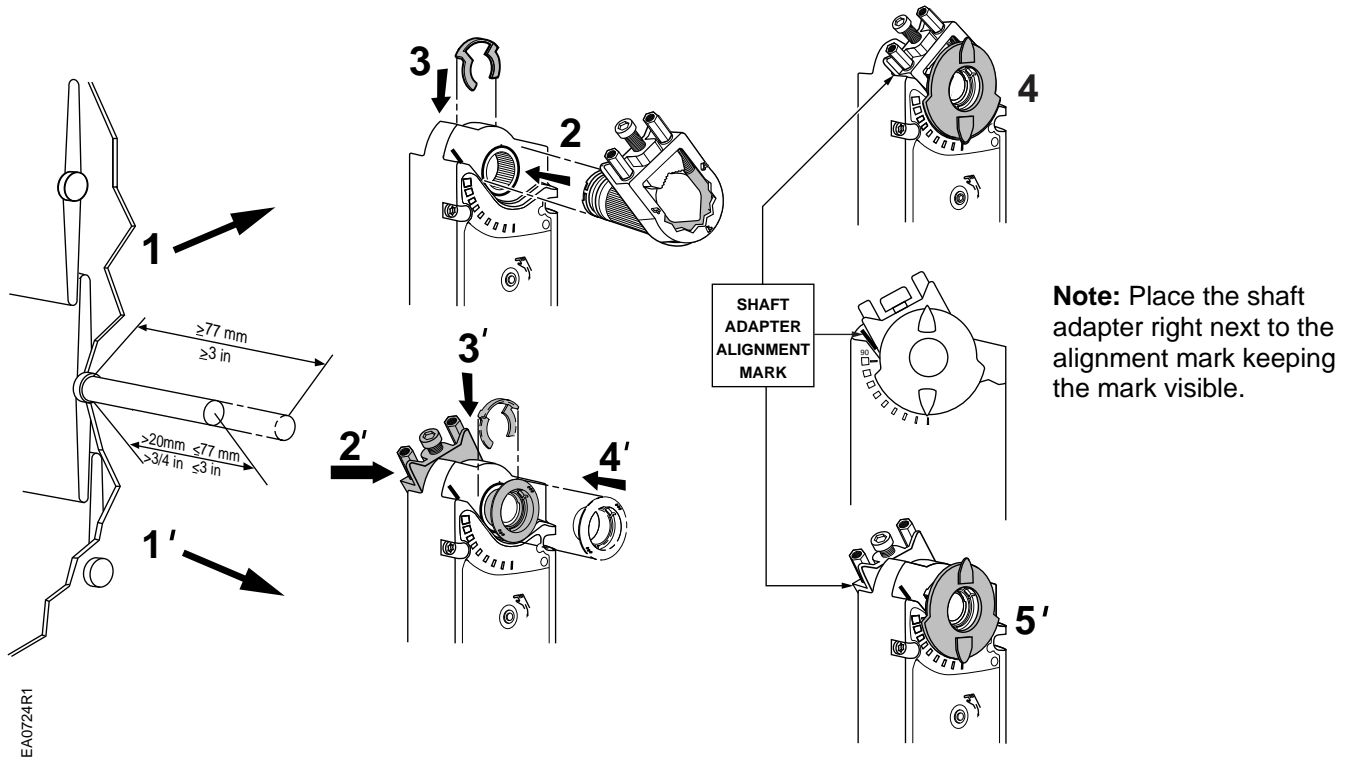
Measure the Damper Shaft and Attach the Shaft Adapter to the Actuator.
